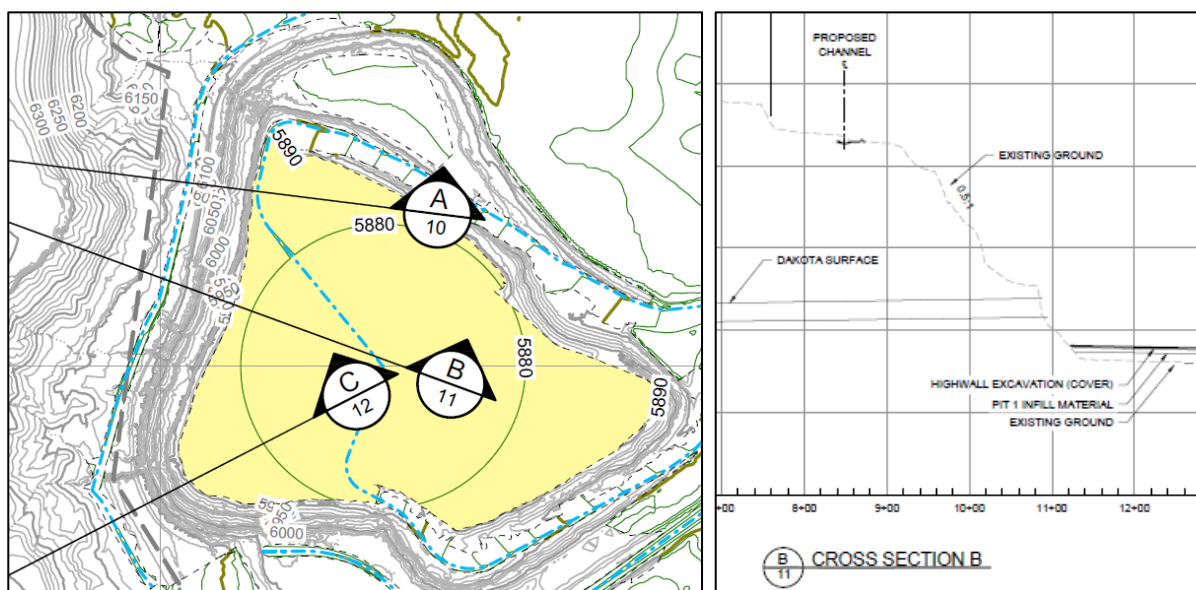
Pit 1 Highwall Excavation and Stabilization
